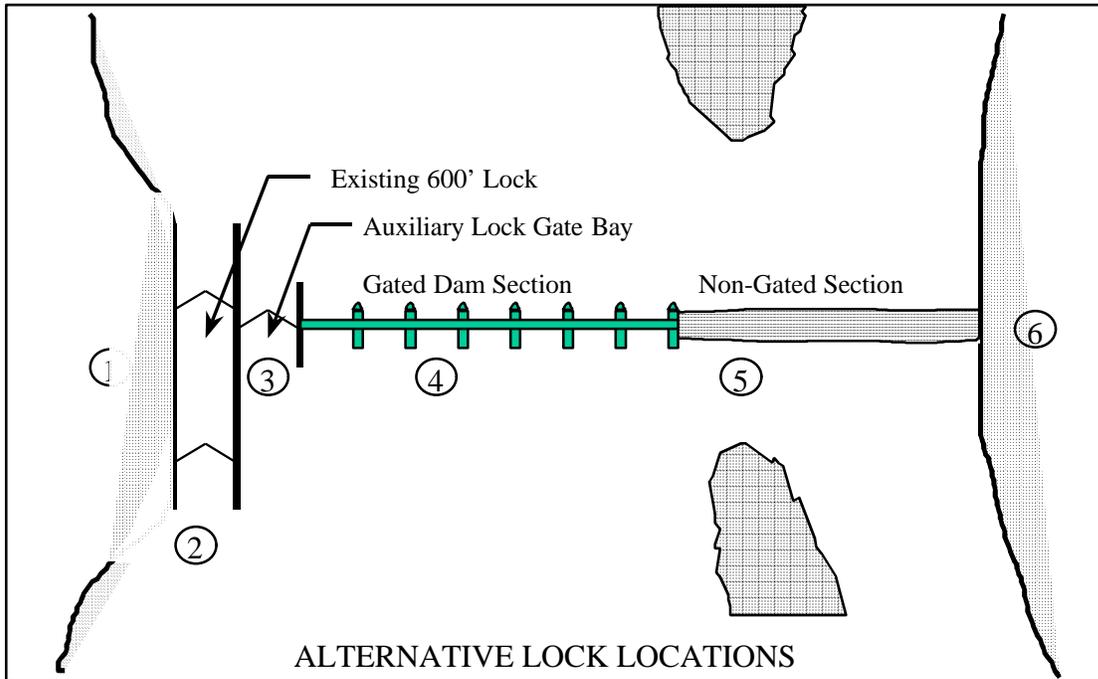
Alternative New Lock Locations at a Typical Existing Lock and Dam Site.
